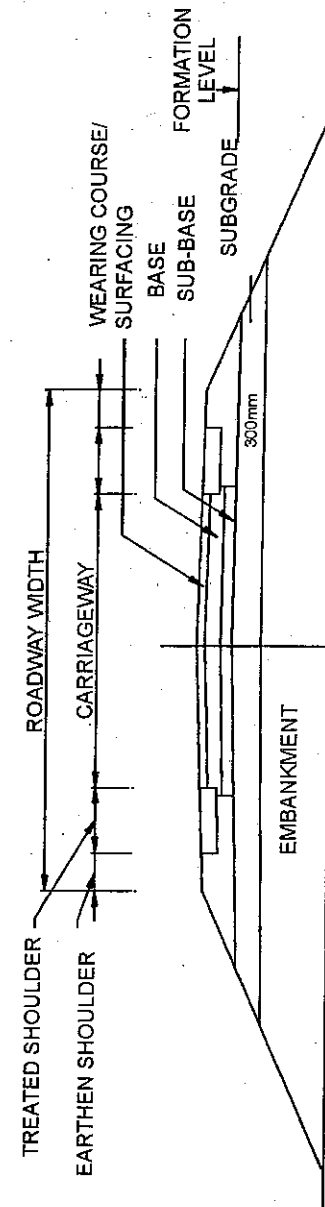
Terms used in the Specifications to describe road cross-section elements with a flexible pavement
